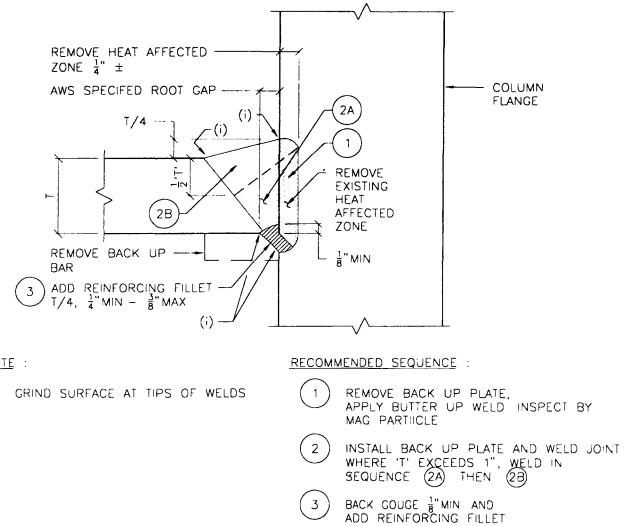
Repair-crack thru beam flange Class B.
